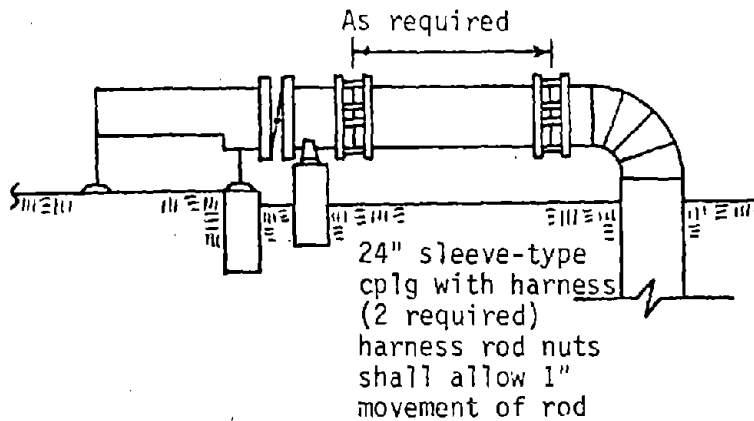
Schematics of a flexible restrained joint for pipe connections to storage tanks (192).
